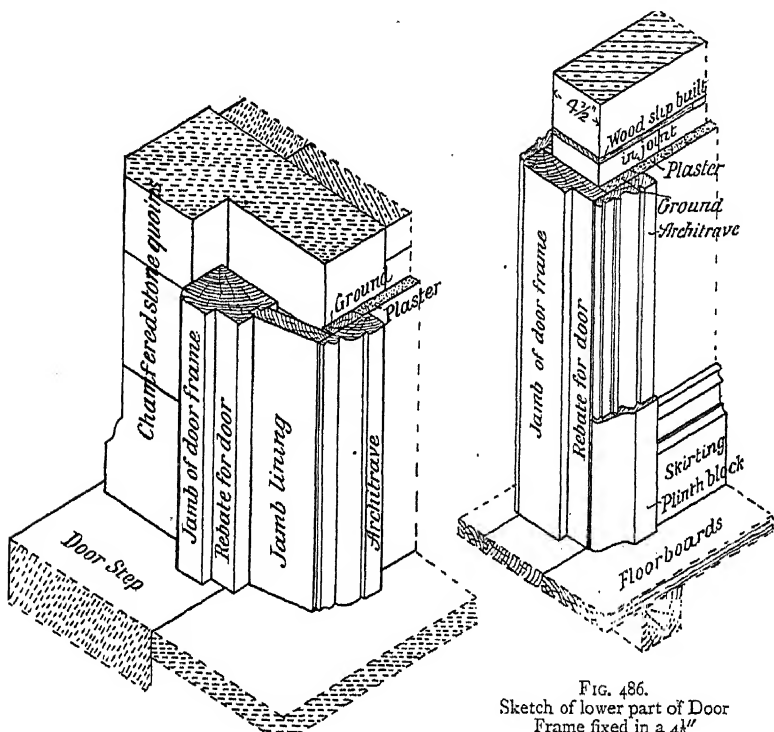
Sketch of lower part of Outer Door Frame, etc., fixed in a Stone Wall.
